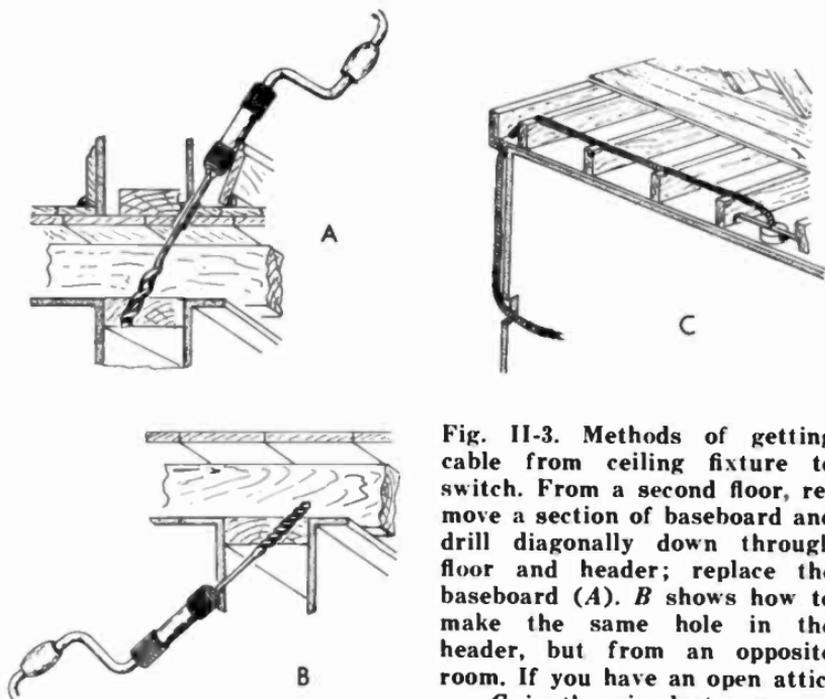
Methods of getting cable from ceiling fixture to switch. From a second floor, remove a section of baseboard and drill diagonally down through floor and header; replace the baseboard (A). B shows how to make the same hole in the header, but from an opposite room. If you have an open attic, C is the simplest way.
